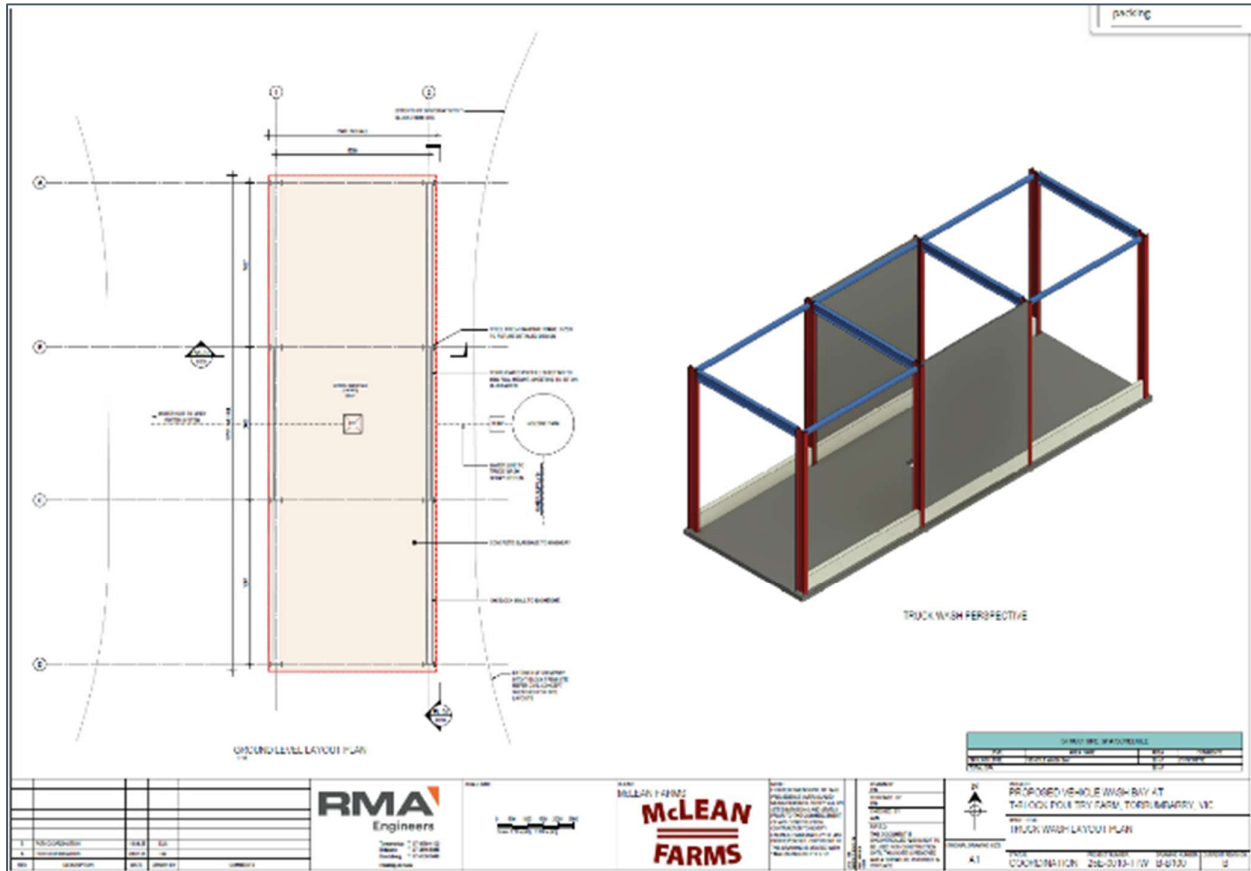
Truck Wash – Ground level plan (RMA Engineers, 2025)
